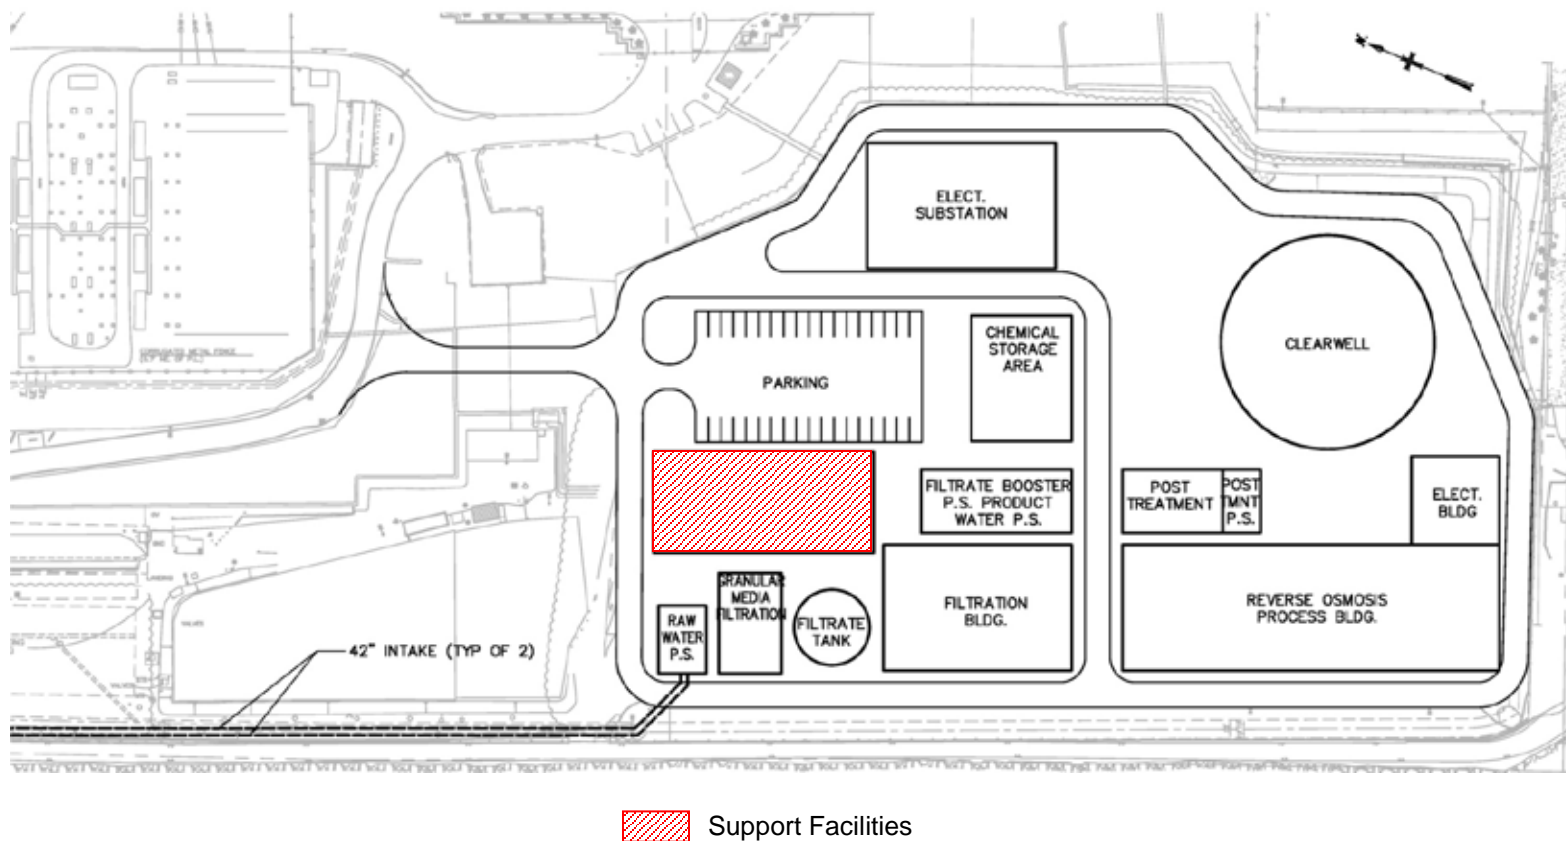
AES Preliminary Site Layout – 20 MGD Support Facilities
